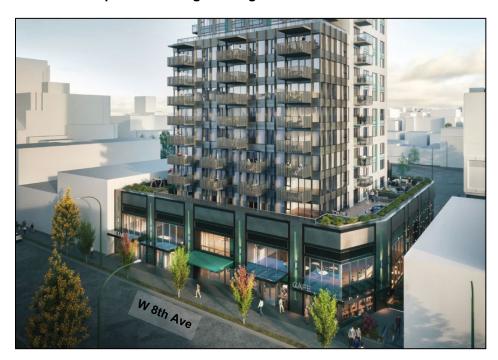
View of the Proposed Building Looking to Southeast from West 8th Avenue
